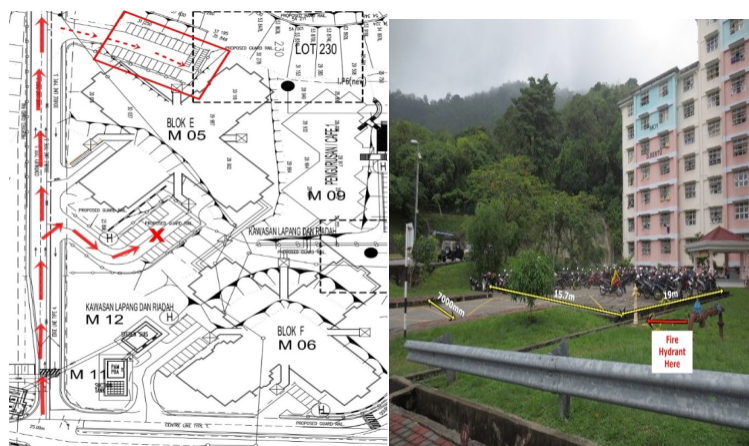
Shows site plan and view at Desasiswa Tekun (M05)
